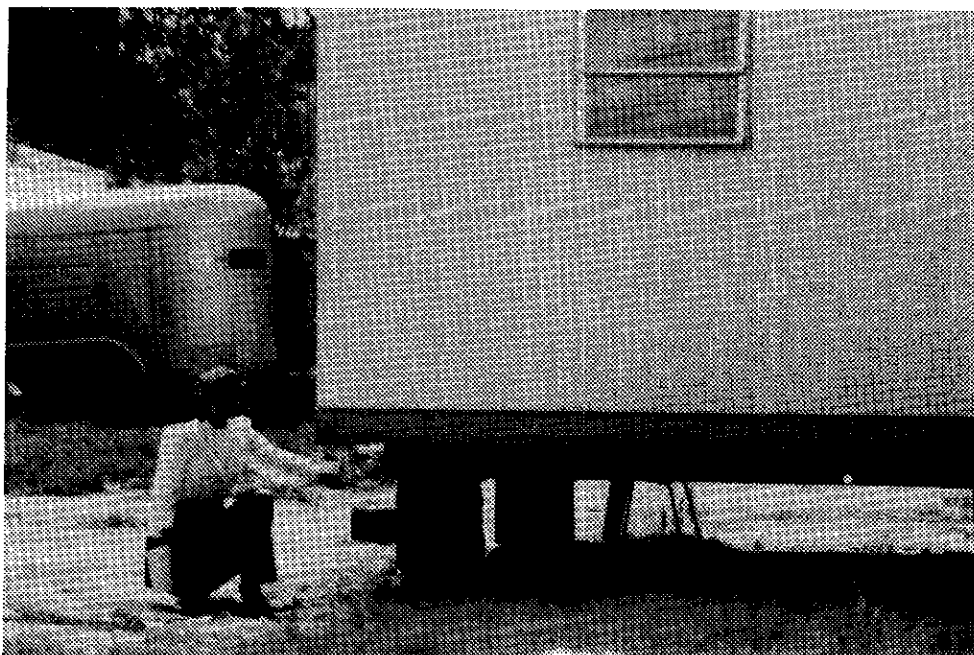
Elevated 3 feet on concrete piers. Secured with tie-downs. La Junta, CO.
